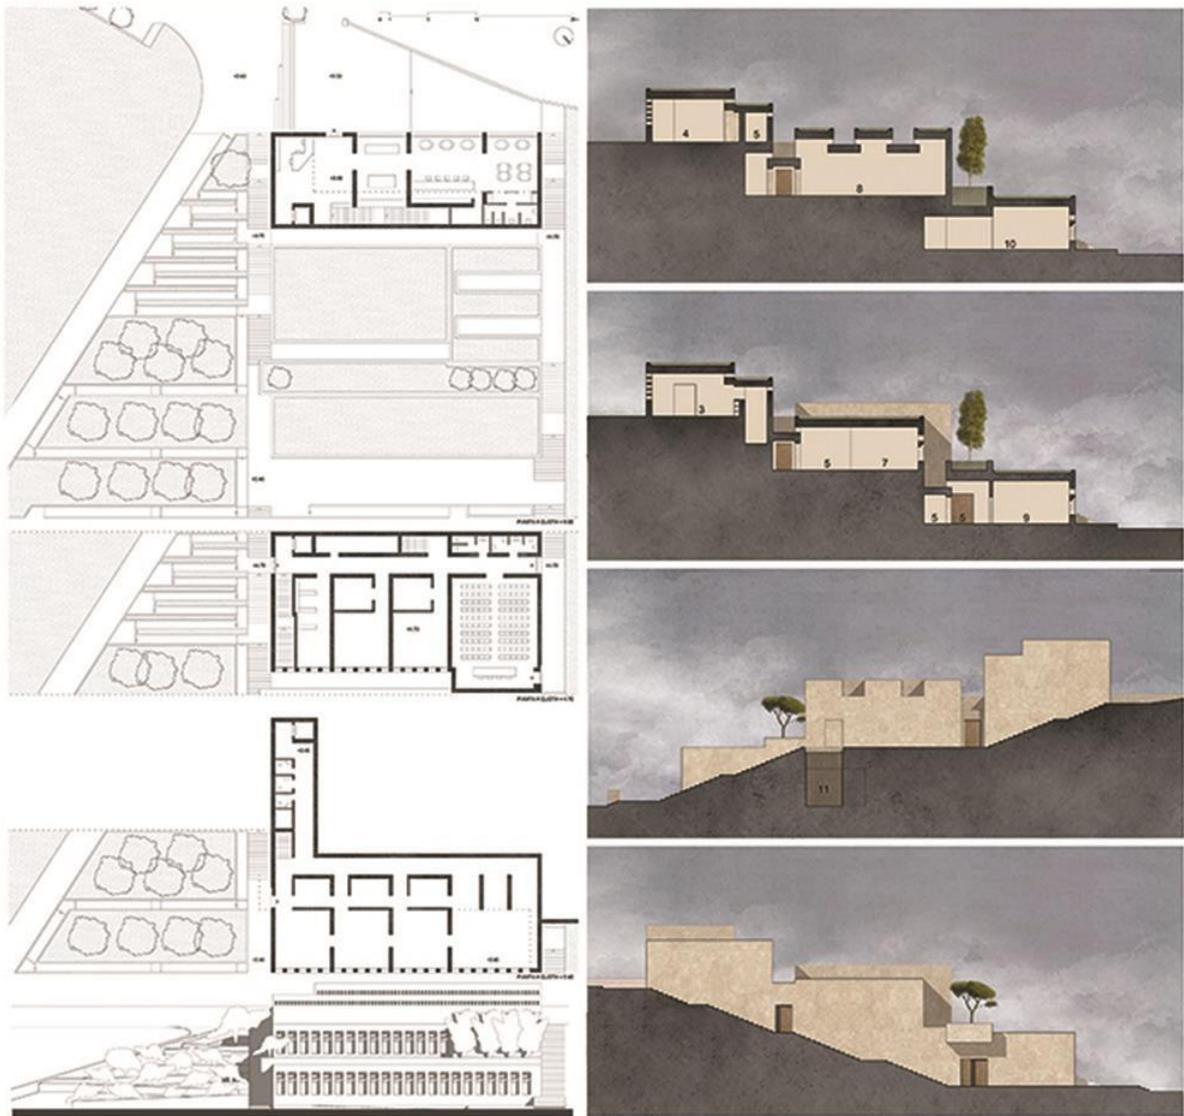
Plans, elevations and sections of the reception services building for visitors to the Archaeological Park.
